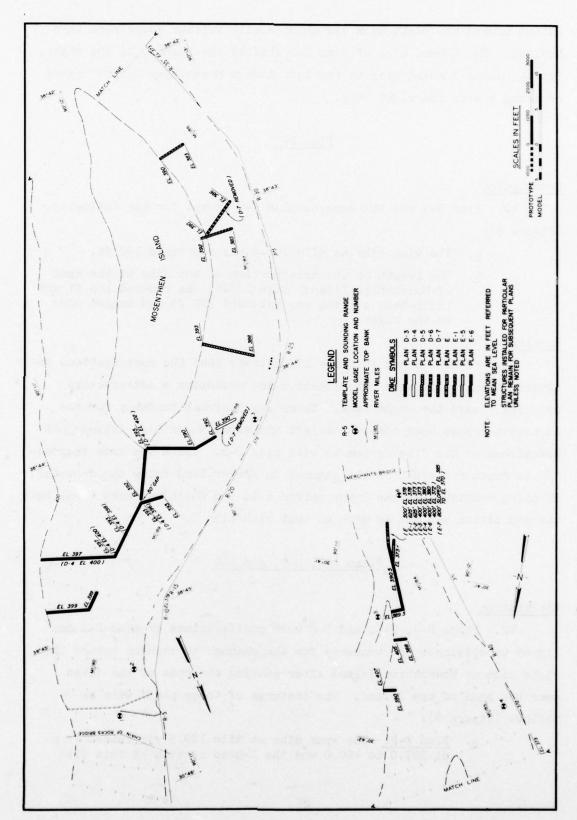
Plans D-3 through D-7, Plan E, and Plans E-1 through E-6
